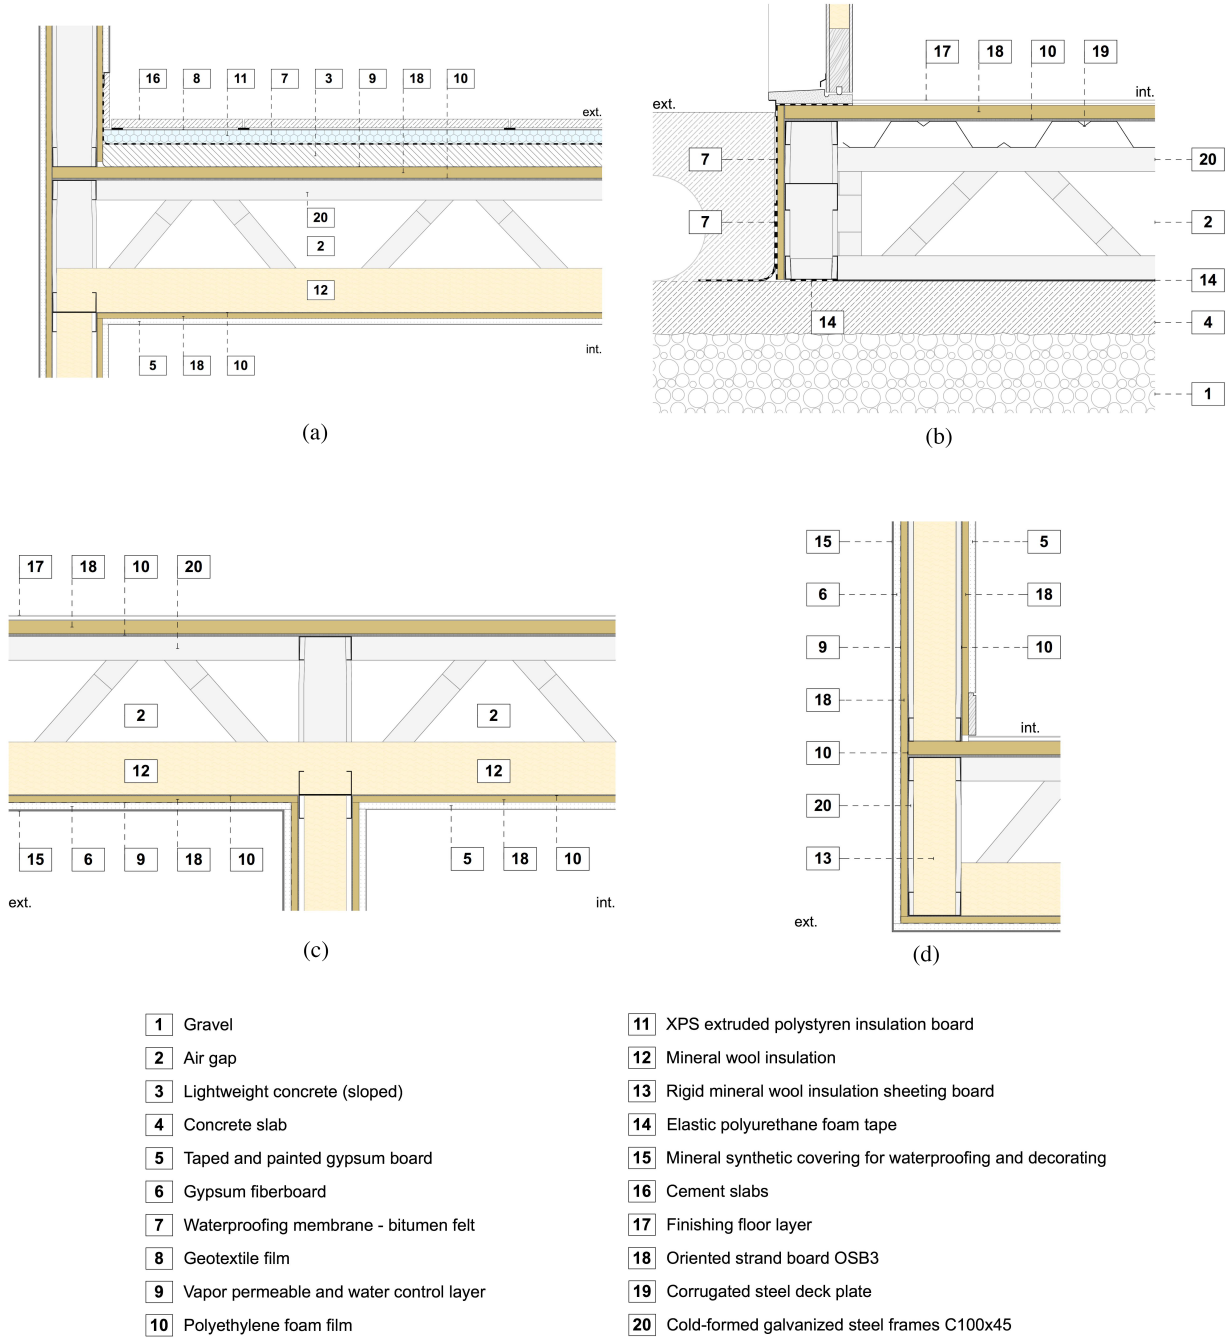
Cross-section of some LSF System B(A)^a construction elements considered in the model: a) accessible flat roof, b) ground floor, c) exterior floor/interior ceiling and d) cold-framed exterior wall (not to scale).
